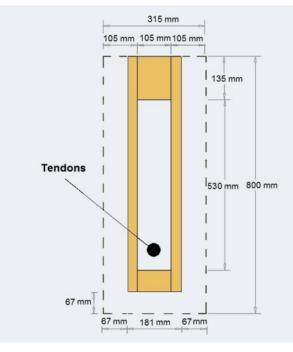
Residual cross-section of a simply-supported post-tensioned beam.
